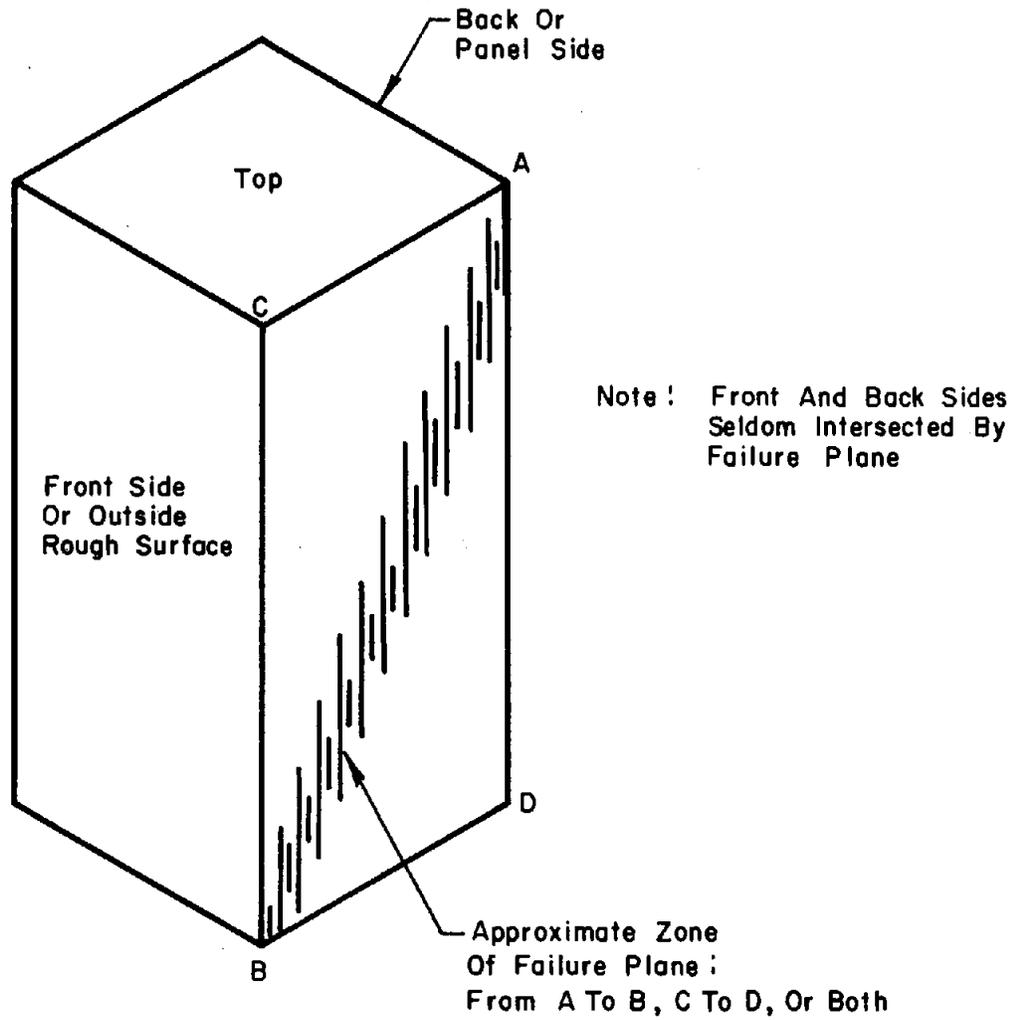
ILLUSTRATION OF TYPICAL FAILURE PLANE FOR COMPRESSION SPECIMEN
